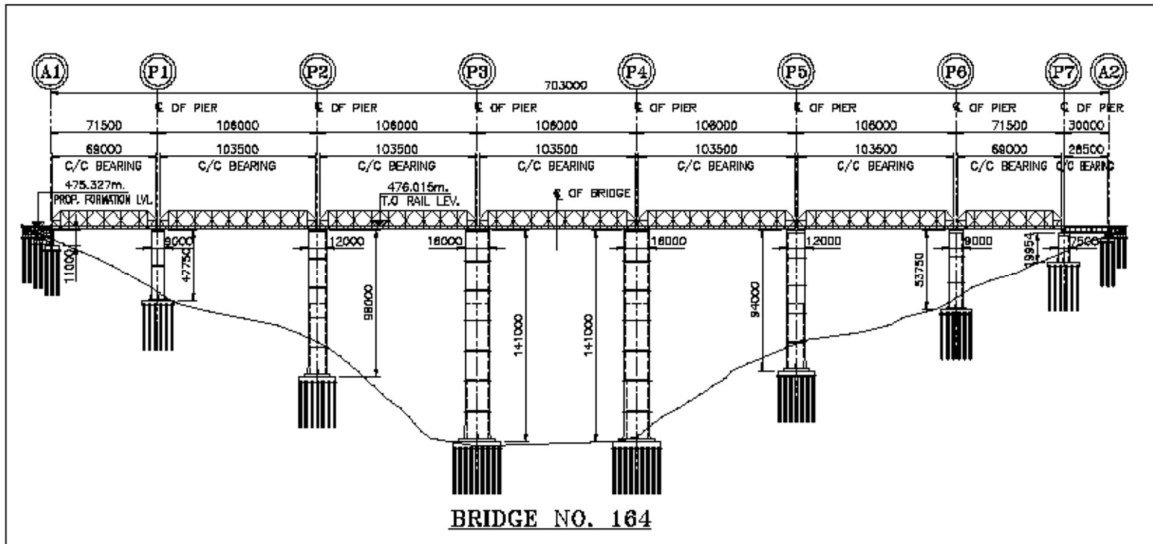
Long span high level bridge (Bridge No. 164) located in Manipur
